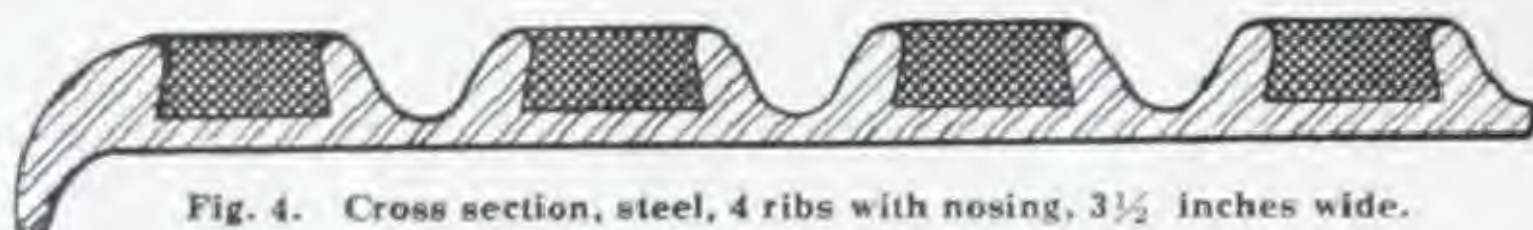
Cross section, steel, 4 ribs with nosing, 3 1/2 inches wide.
